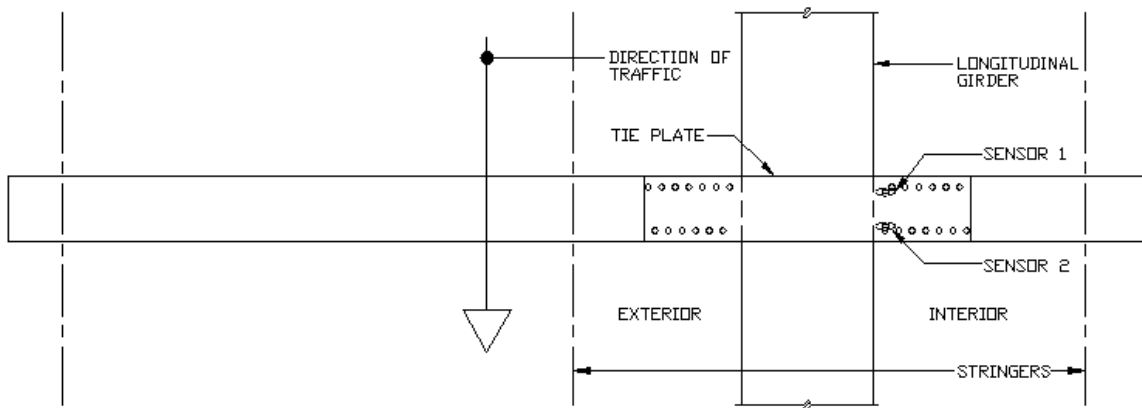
Strain gage layout for the first stage of strain monitoring, with gages located both on an uncracked tie plate and a cracked tie plate.
